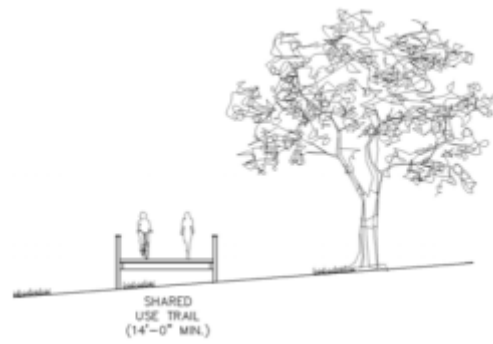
TYPICAL BOARDWALK SECTION
